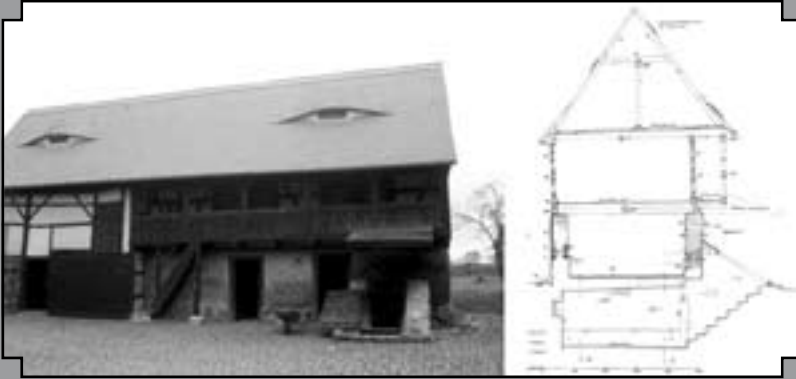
Stables in Neunkirchen-Wyhra, Saxony (C. Ziegert).
